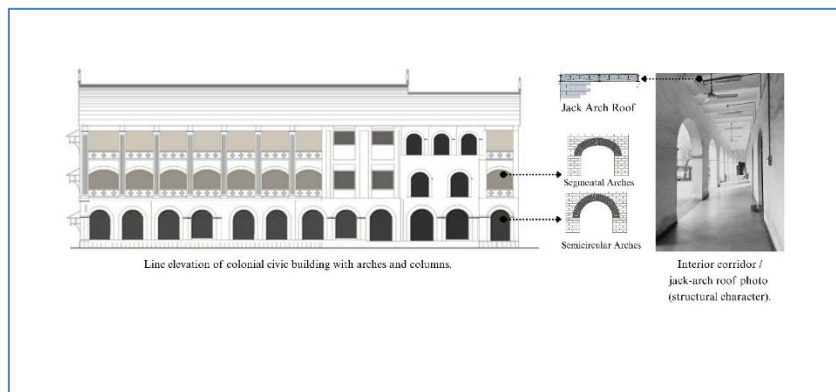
AMC elevation line drawing, showing repetition of arch typologies and jack-arched ceilings.
